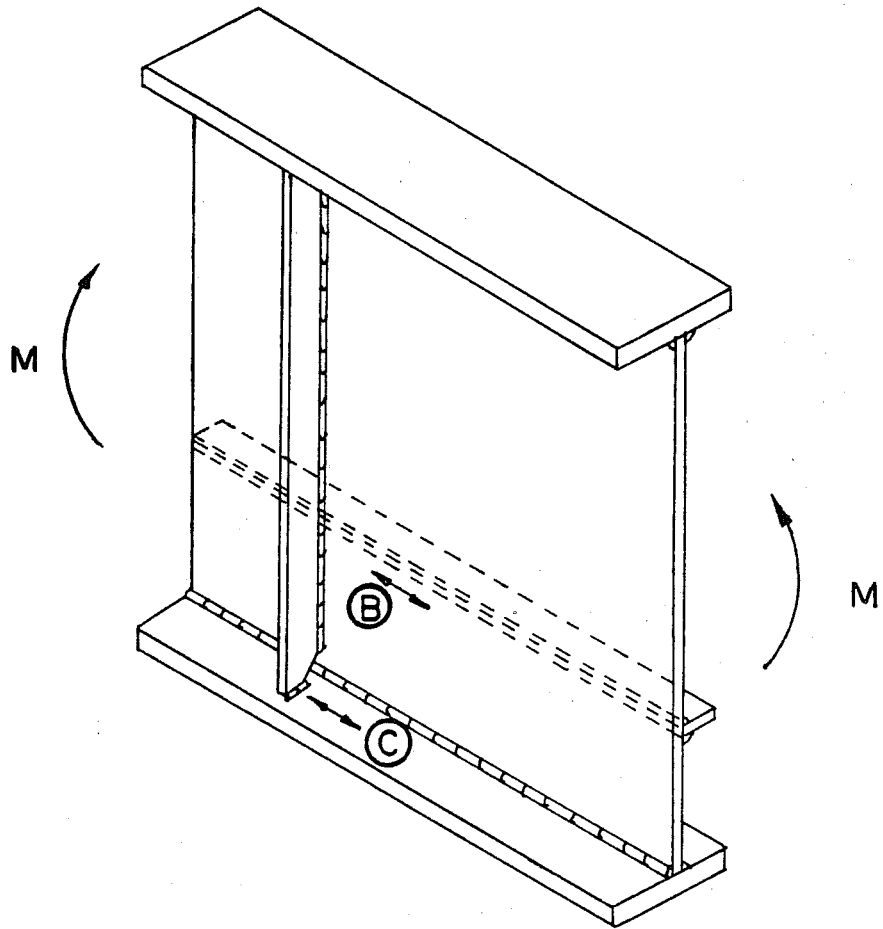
Longitudinal and transverse stiffeners placed on opposite sides of girder web
